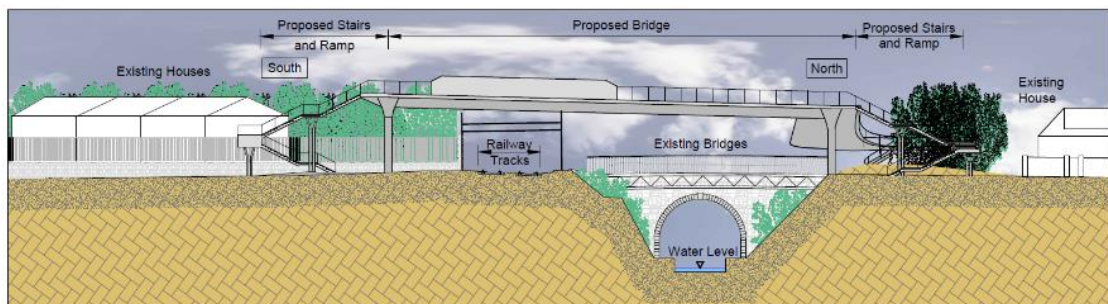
Coolmine Emerging Preferred Option: Cycle Bridge - Sectional Elevation
